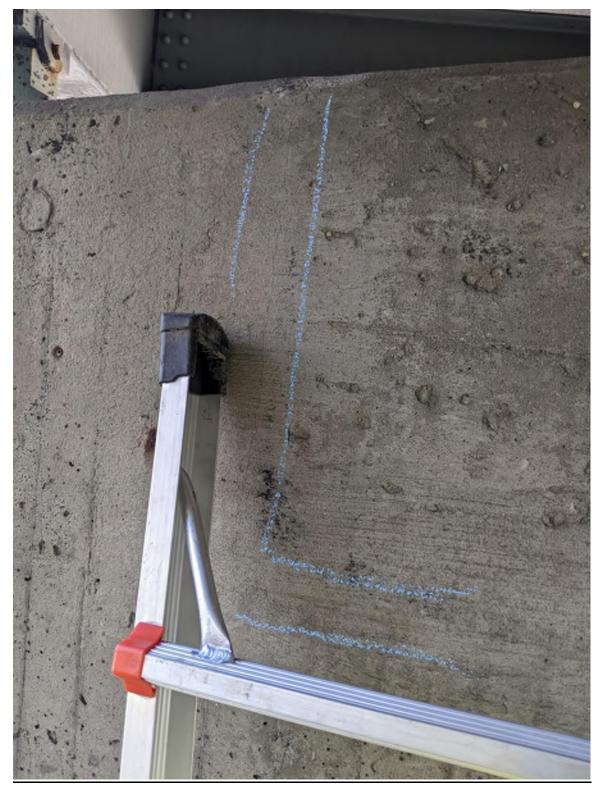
Location of Proposed Concrete Repairs - Pier 3 Underside of Pier Cap MP 182.1
